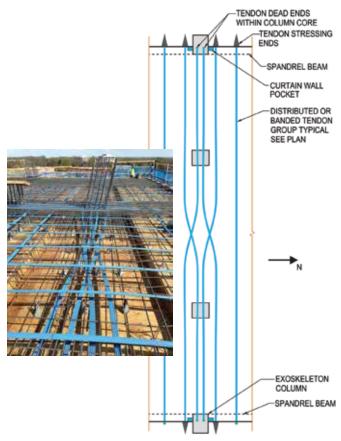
The post-tensioned (PT) tendons were crossed at midspan to conceal the dead-end anchors inside the exoskeleton columns (photo courtesy of DAVIS)
